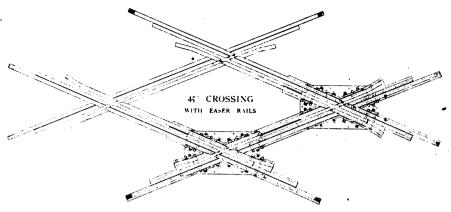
A THREE-RAIL BUTT-JOINT CROSSING
